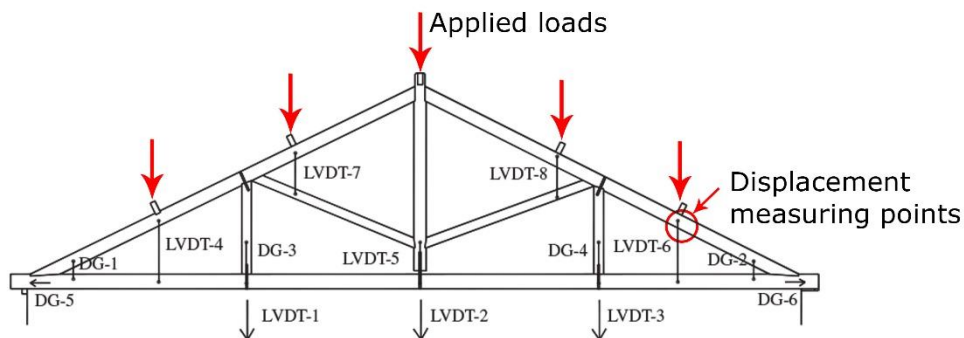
Testing layout of the Adico warehouse roof truss – second series of tests (after [137])
